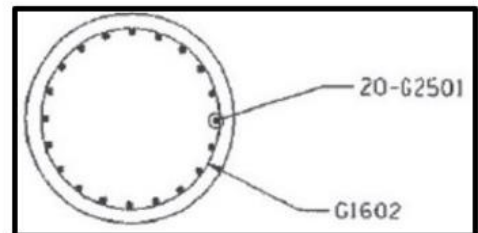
illustrates the connection details used in the Lafayette Bridge of Minnesota, which involves rebar for the connection. On the other hand, Figure 2-17 presents the connection details adopted by the Hastings Bridge, which utilizes shear studs for the connection.
